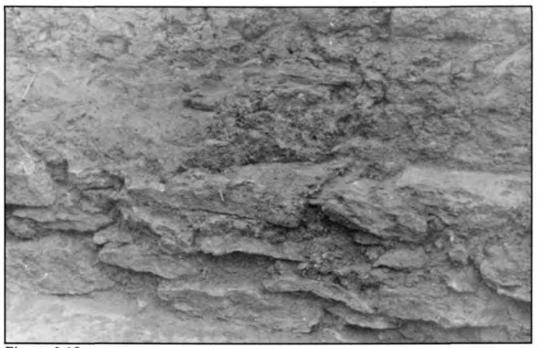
Detail of south wall foundation on room interior showing adobe coping between adobe brick wall and stone foundation.
